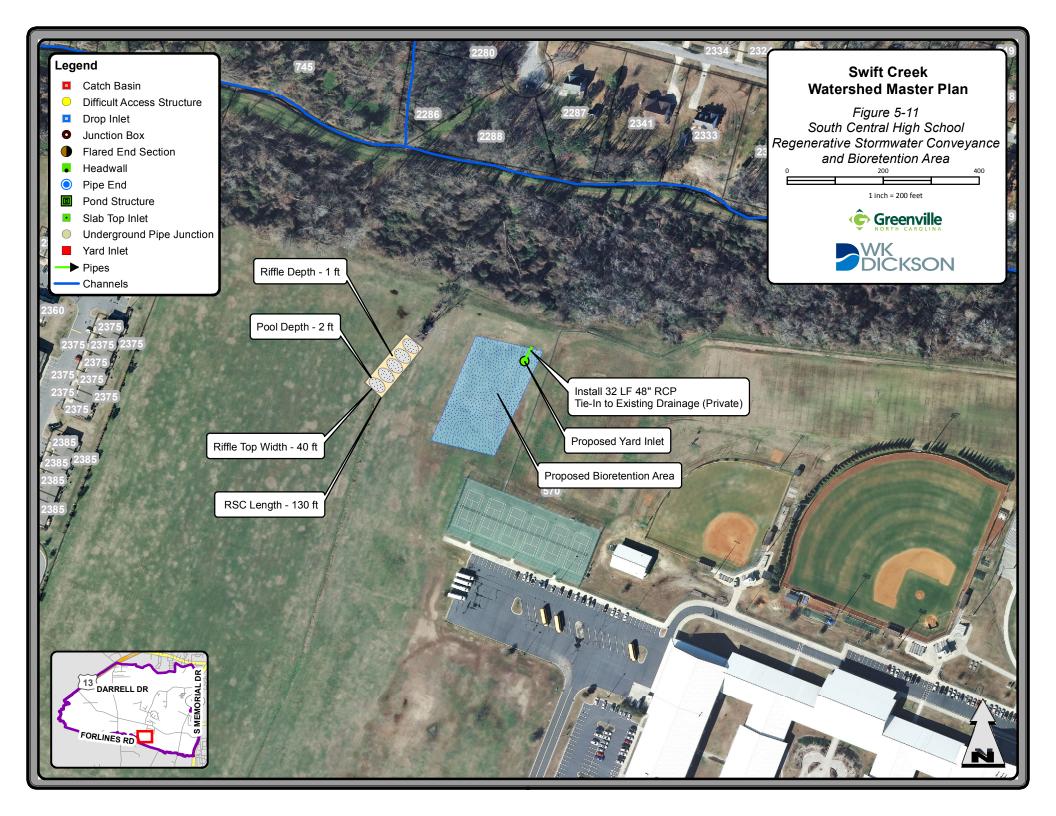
Proposed Location for South Central High School Bioretention Area
